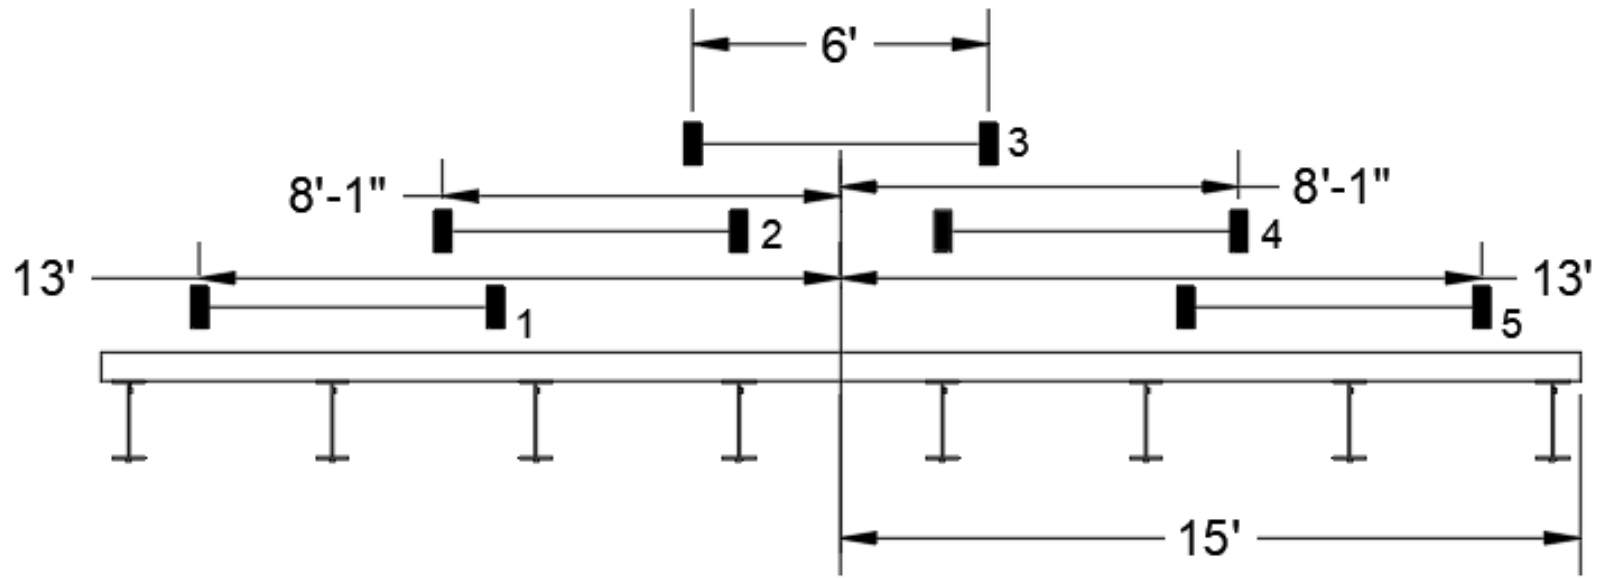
Load Test Plan for 2<sup>nd</sup> Yutan Bridge Load Test
